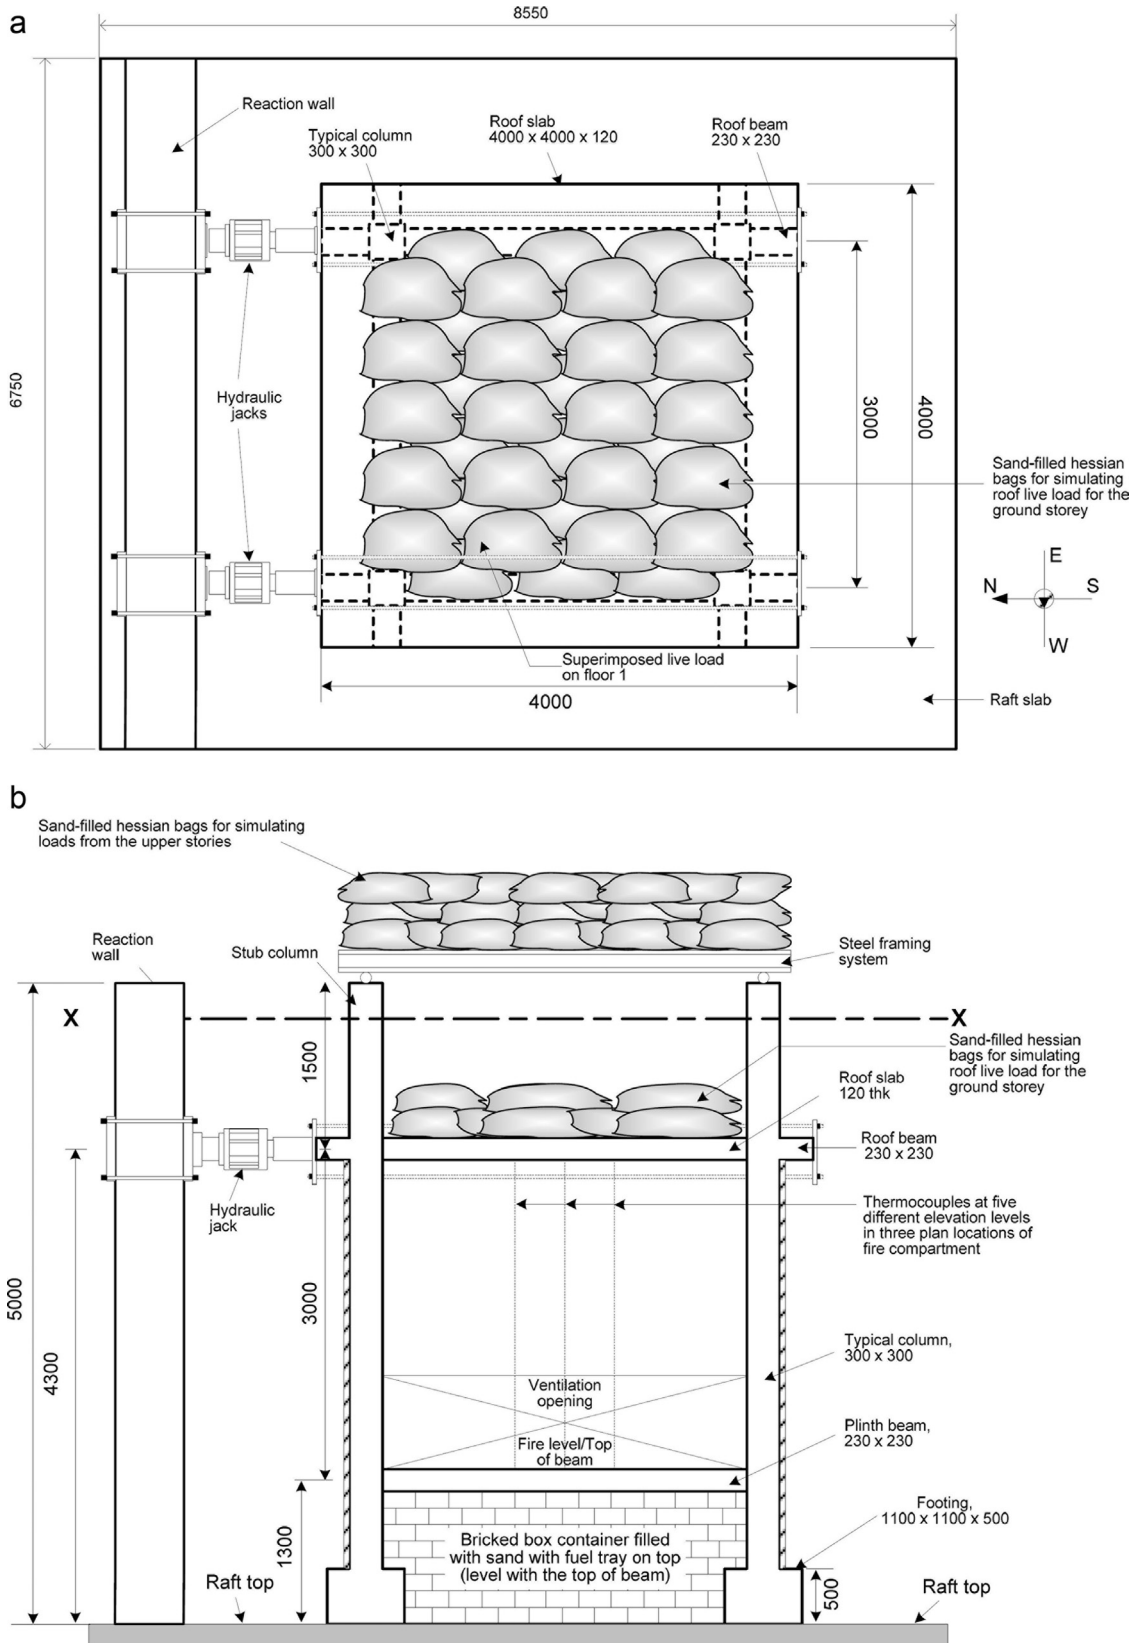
Schematic of the test setup (a) plan and (b) elevation.
